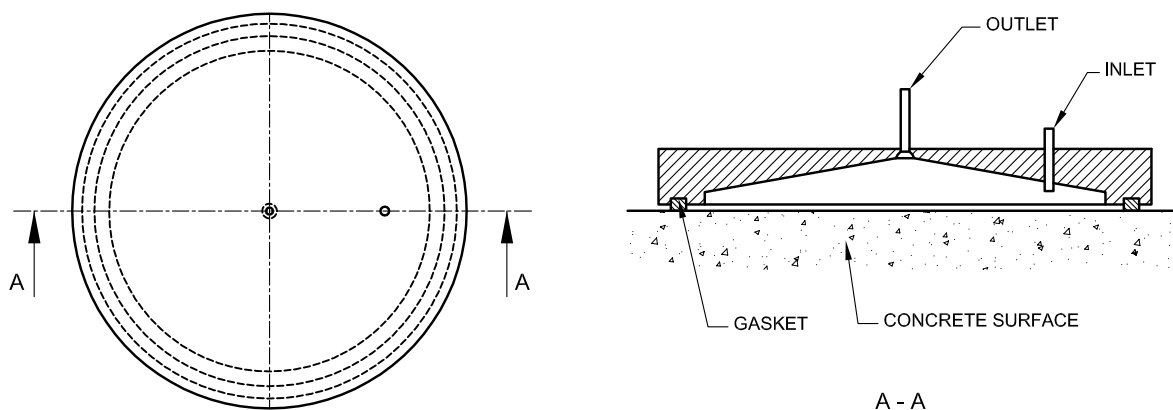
TYPICAL CAP SUITABLE FOR CLAMPING INTO A SMOOTH HORIZONTAL SURFACE
